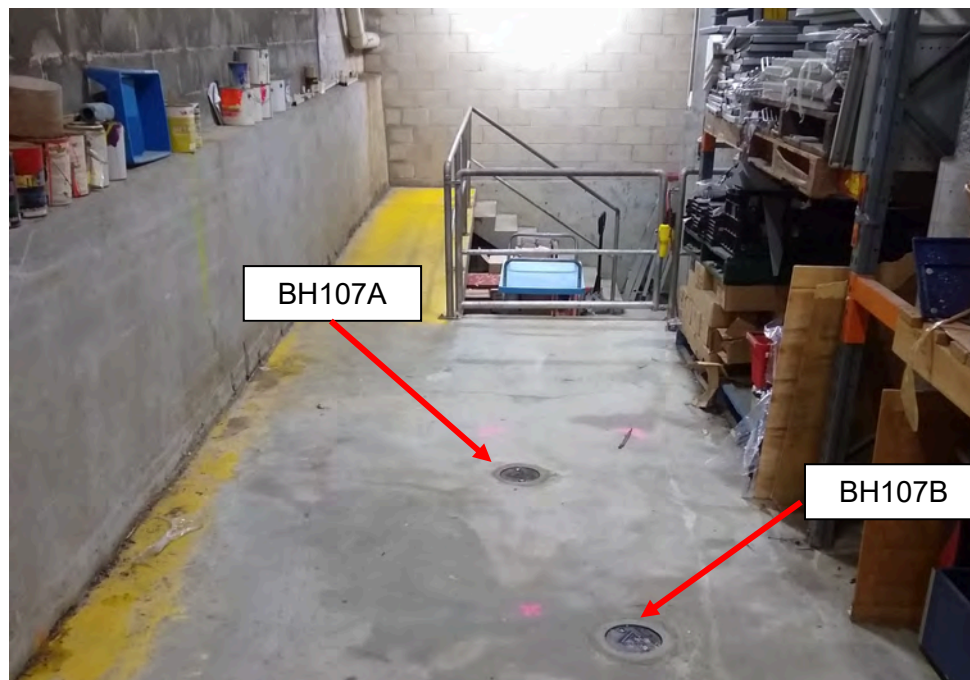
View south-west within a concrete-walled storage area at the Lower Ground Floor Level. A set of steps leading down to the Henry Deane Plaza is present overhead. The position of boreholes BH107A and BH107B (with installed standpipes) are indicated as shown.
